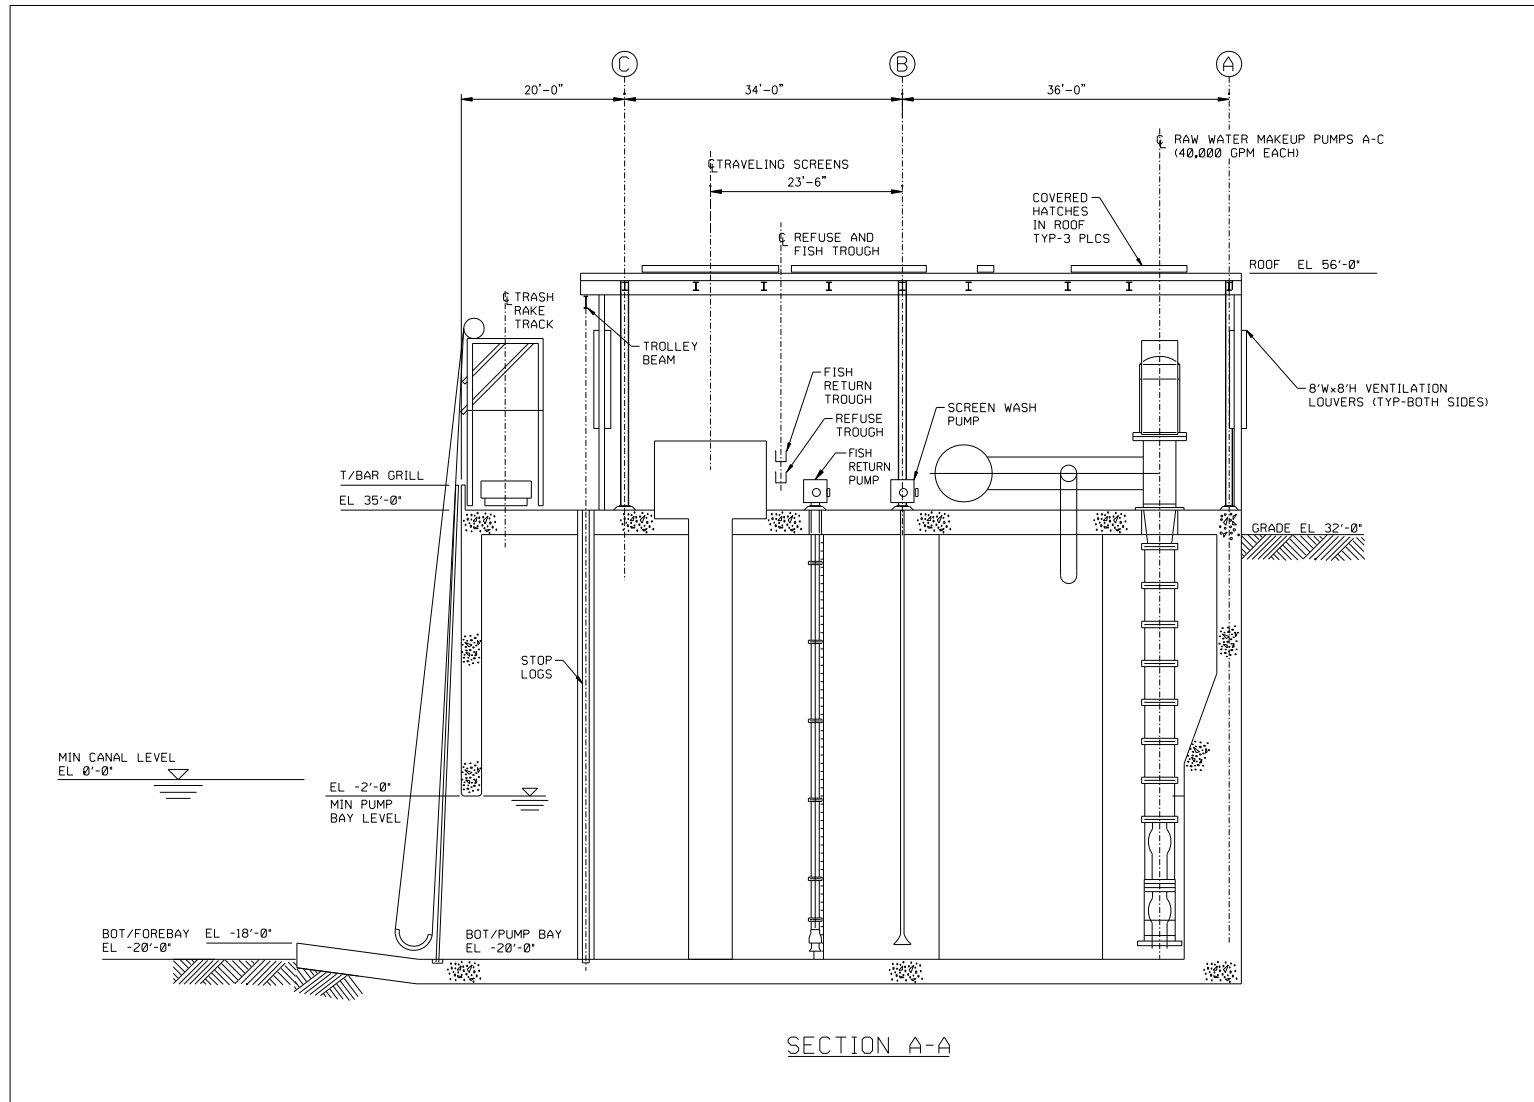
RWMU Intake Structure (Section View) — Typical
